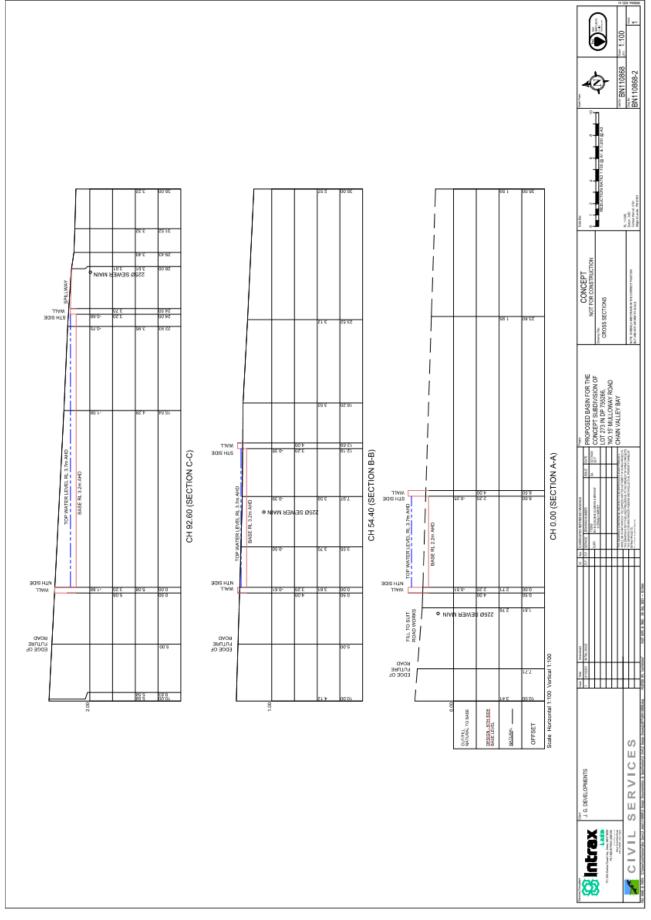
Concept stormwater basin cross sections (Source: Intrax 6.10.2021)
